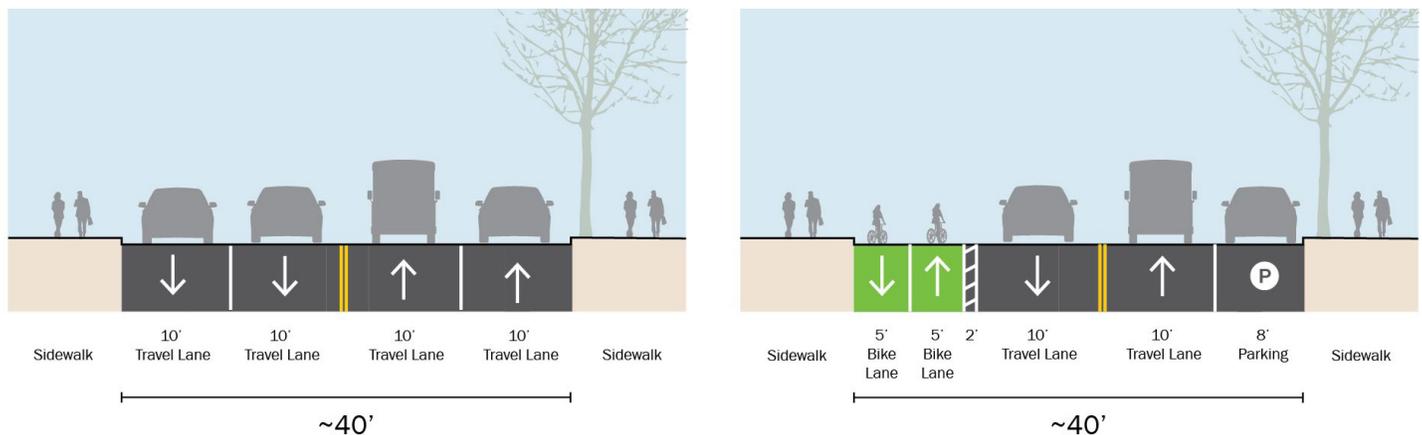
Alternative 1: Existing and Potential Cross Section of Central Avenue (looking west)
